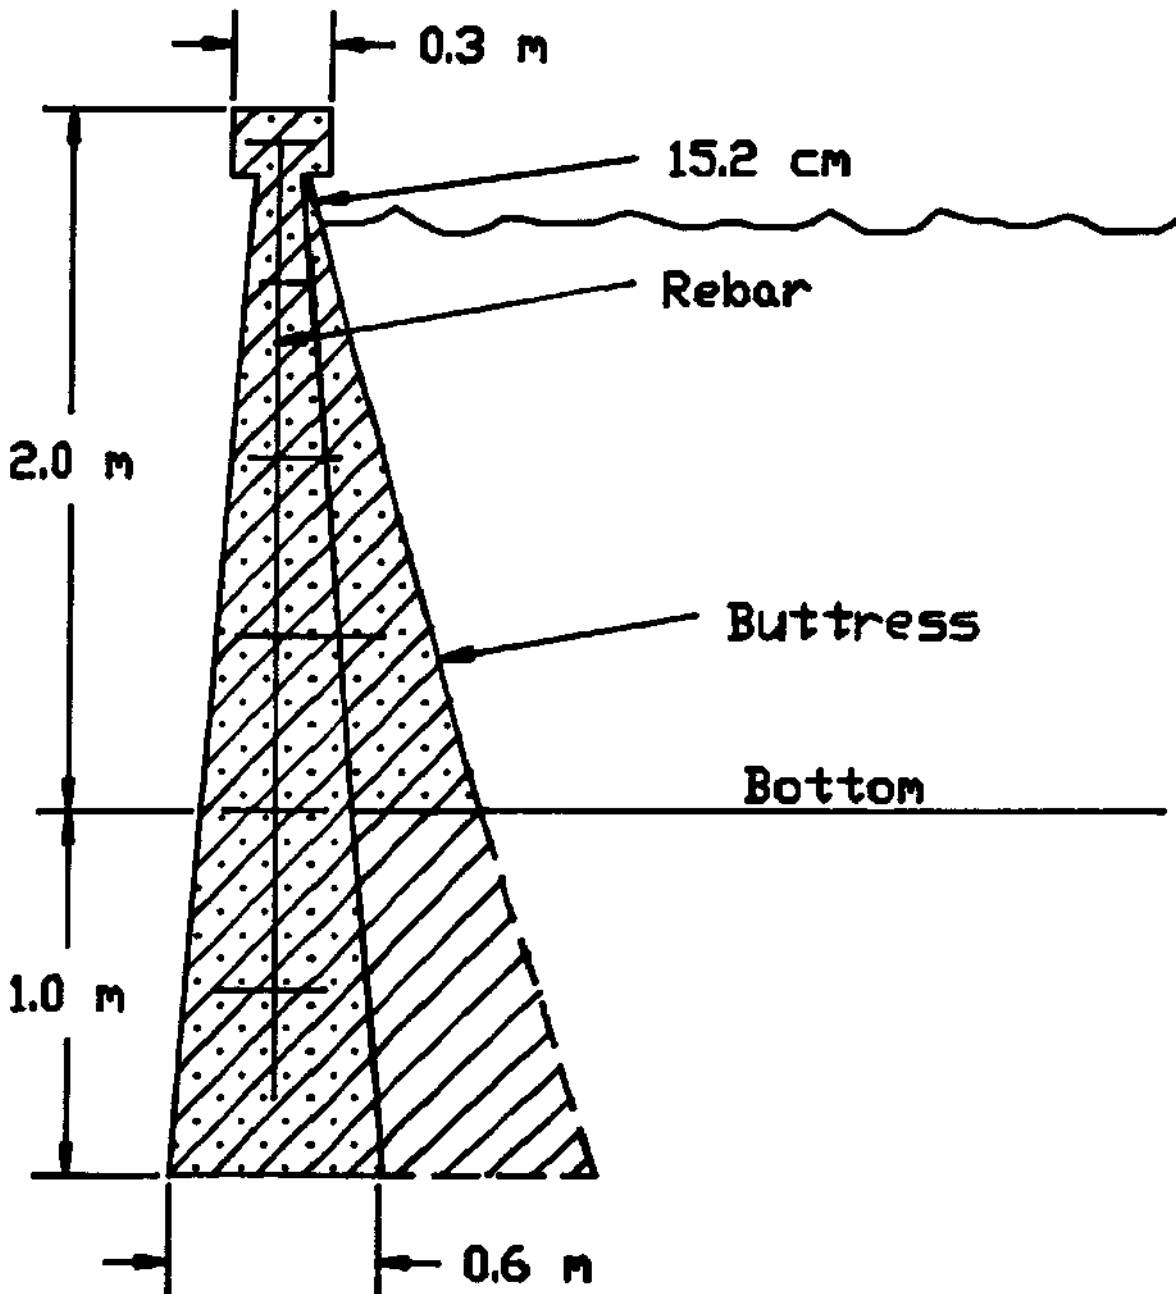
Cross-section of reinforced concrete wall at farm 2.
